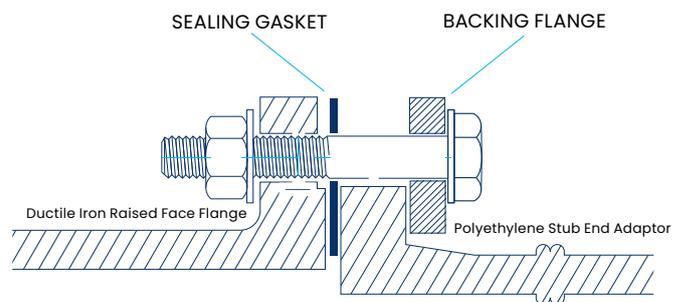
Ductile Iron Raised Face Flange to PE Stub End Adaptor
